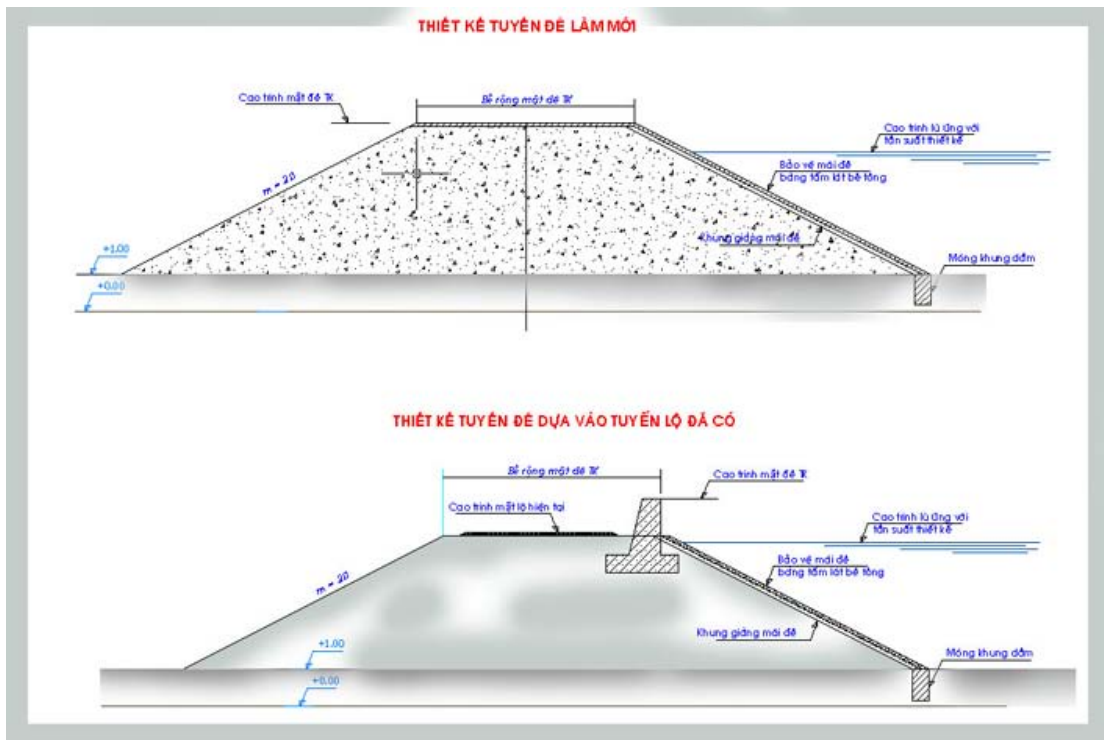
Typical cross-sections of embankment for new and upgrading dyke
